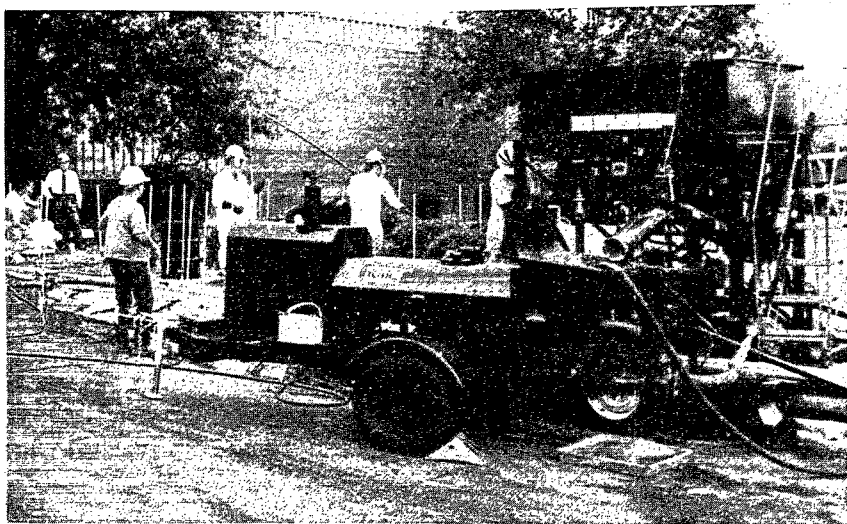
Slurry mixing and pumping equipment mounted on trailers.
